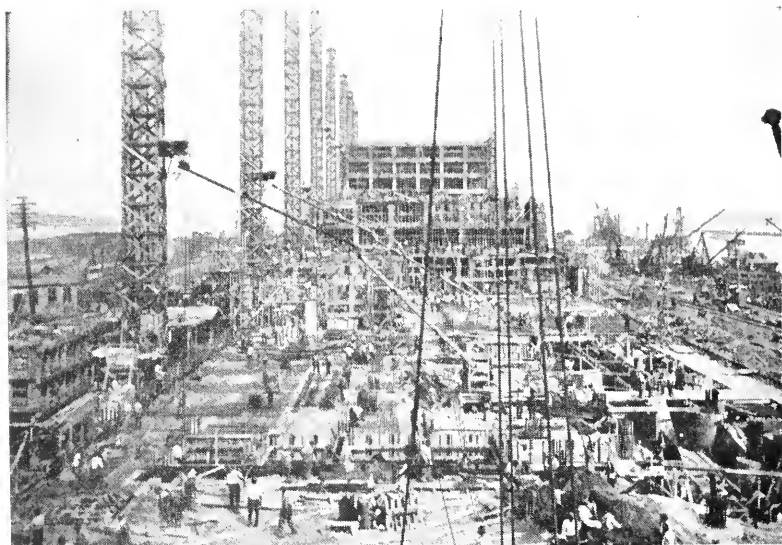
WAREHOUSE UNDER CONSTRUCTION (AUG. 22, 1918).
